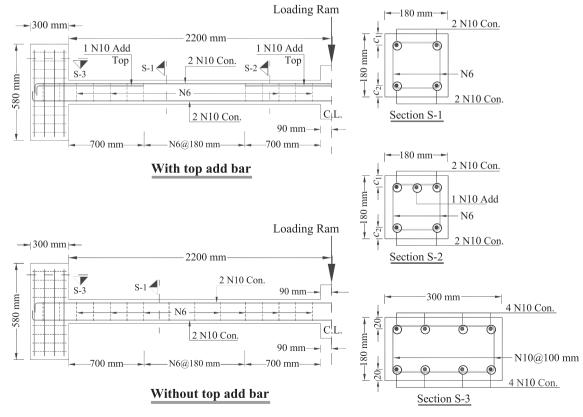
Outline of the geometry, cross-section and reinforcing details for the beam assemblages with and without top add bars over the end supports and centre stub.
